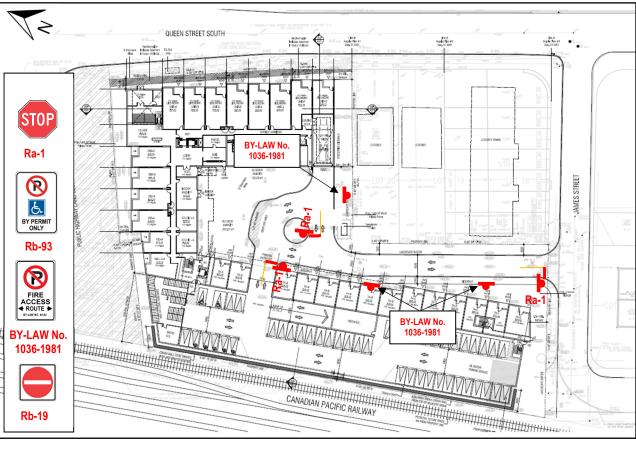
Preliminary Proposed Pavement Marking and Signage Plan
